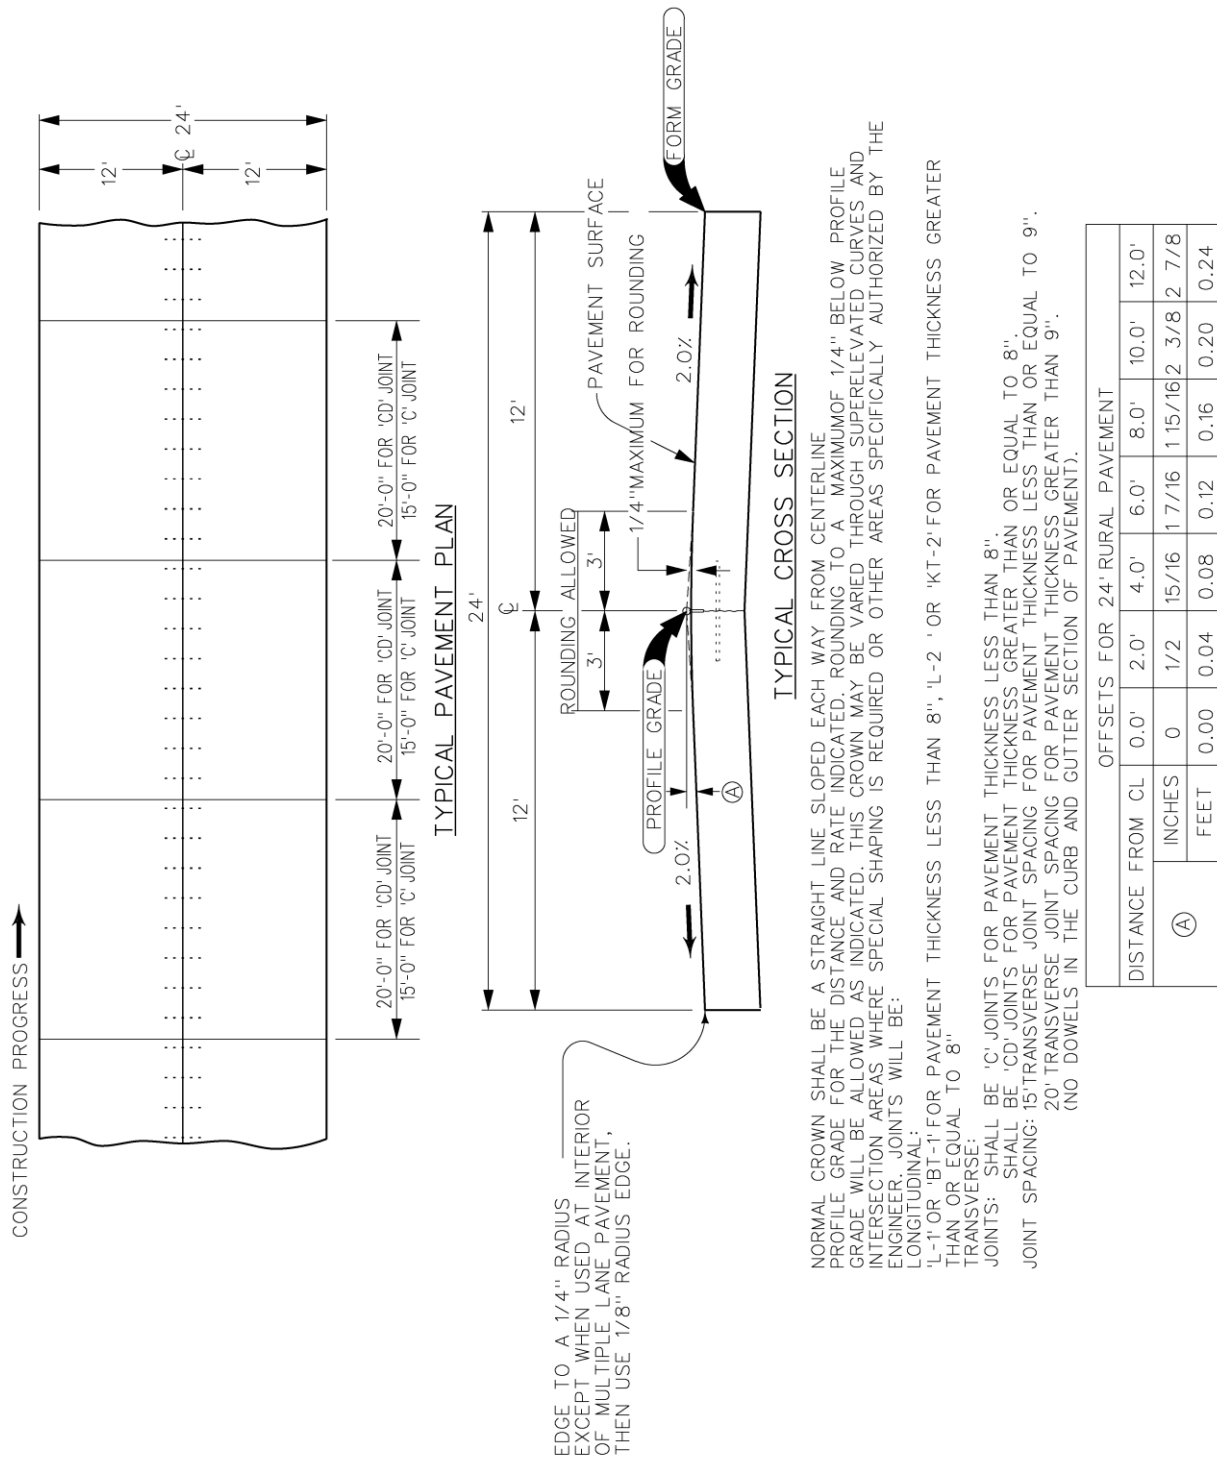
G-2.15: 24' Rural PCC Pavement Jointing and Crown Detail
